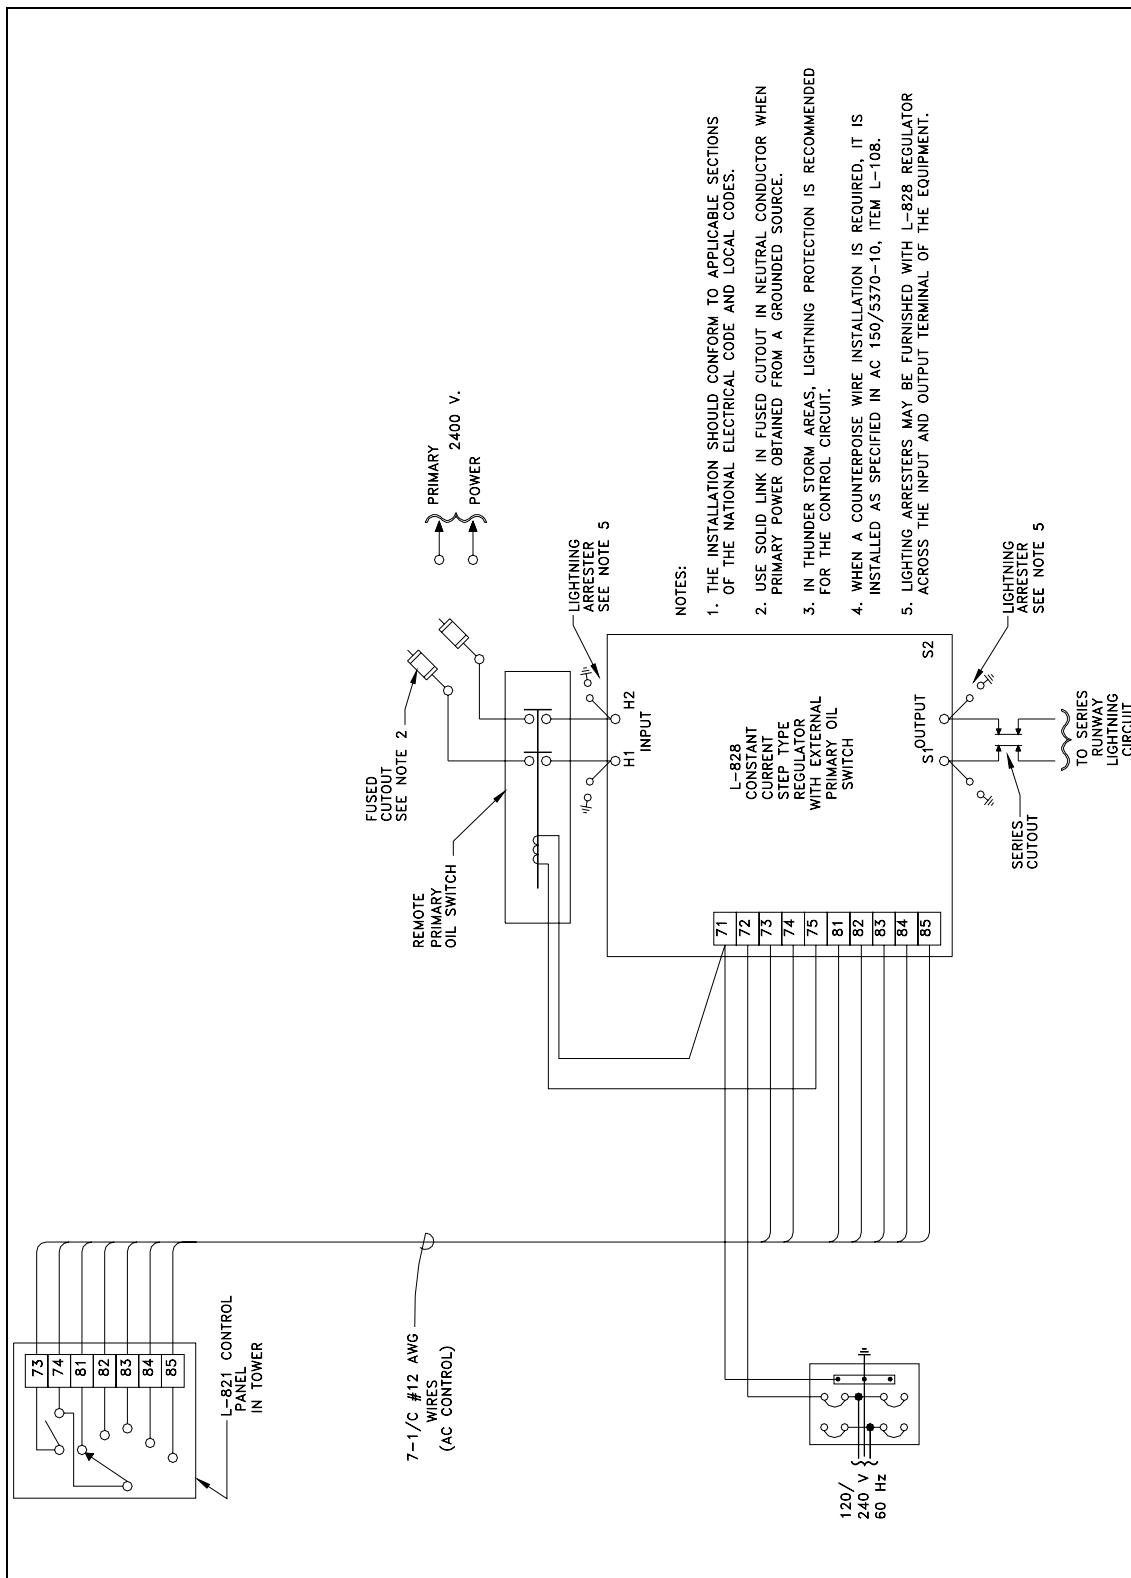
Typical Wiring Diagram Utilizing L-828 Step-type Regulator with External Remote Primary Oil Switch
